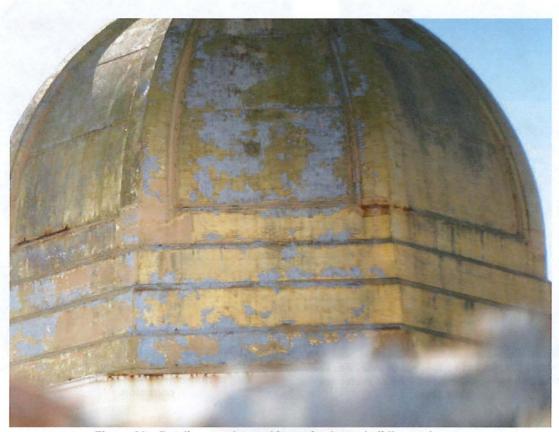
Detail, corrosion and loss of paint and gilding at domes.
